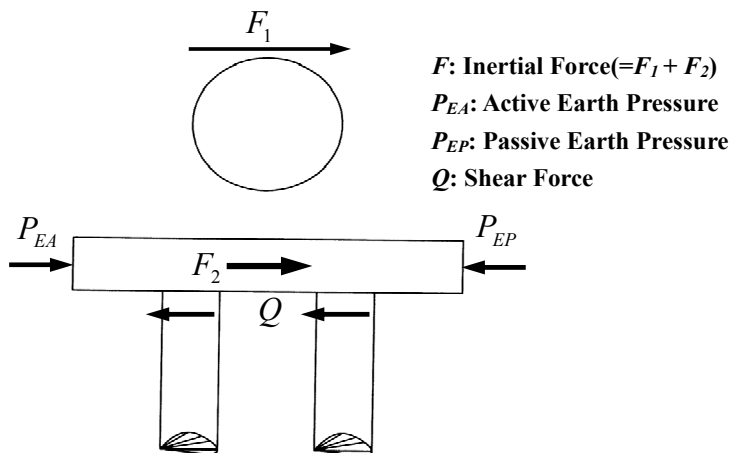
Schematic layout of forces acting on Foundation (from Uchida and Tokimatsu, 2005)
